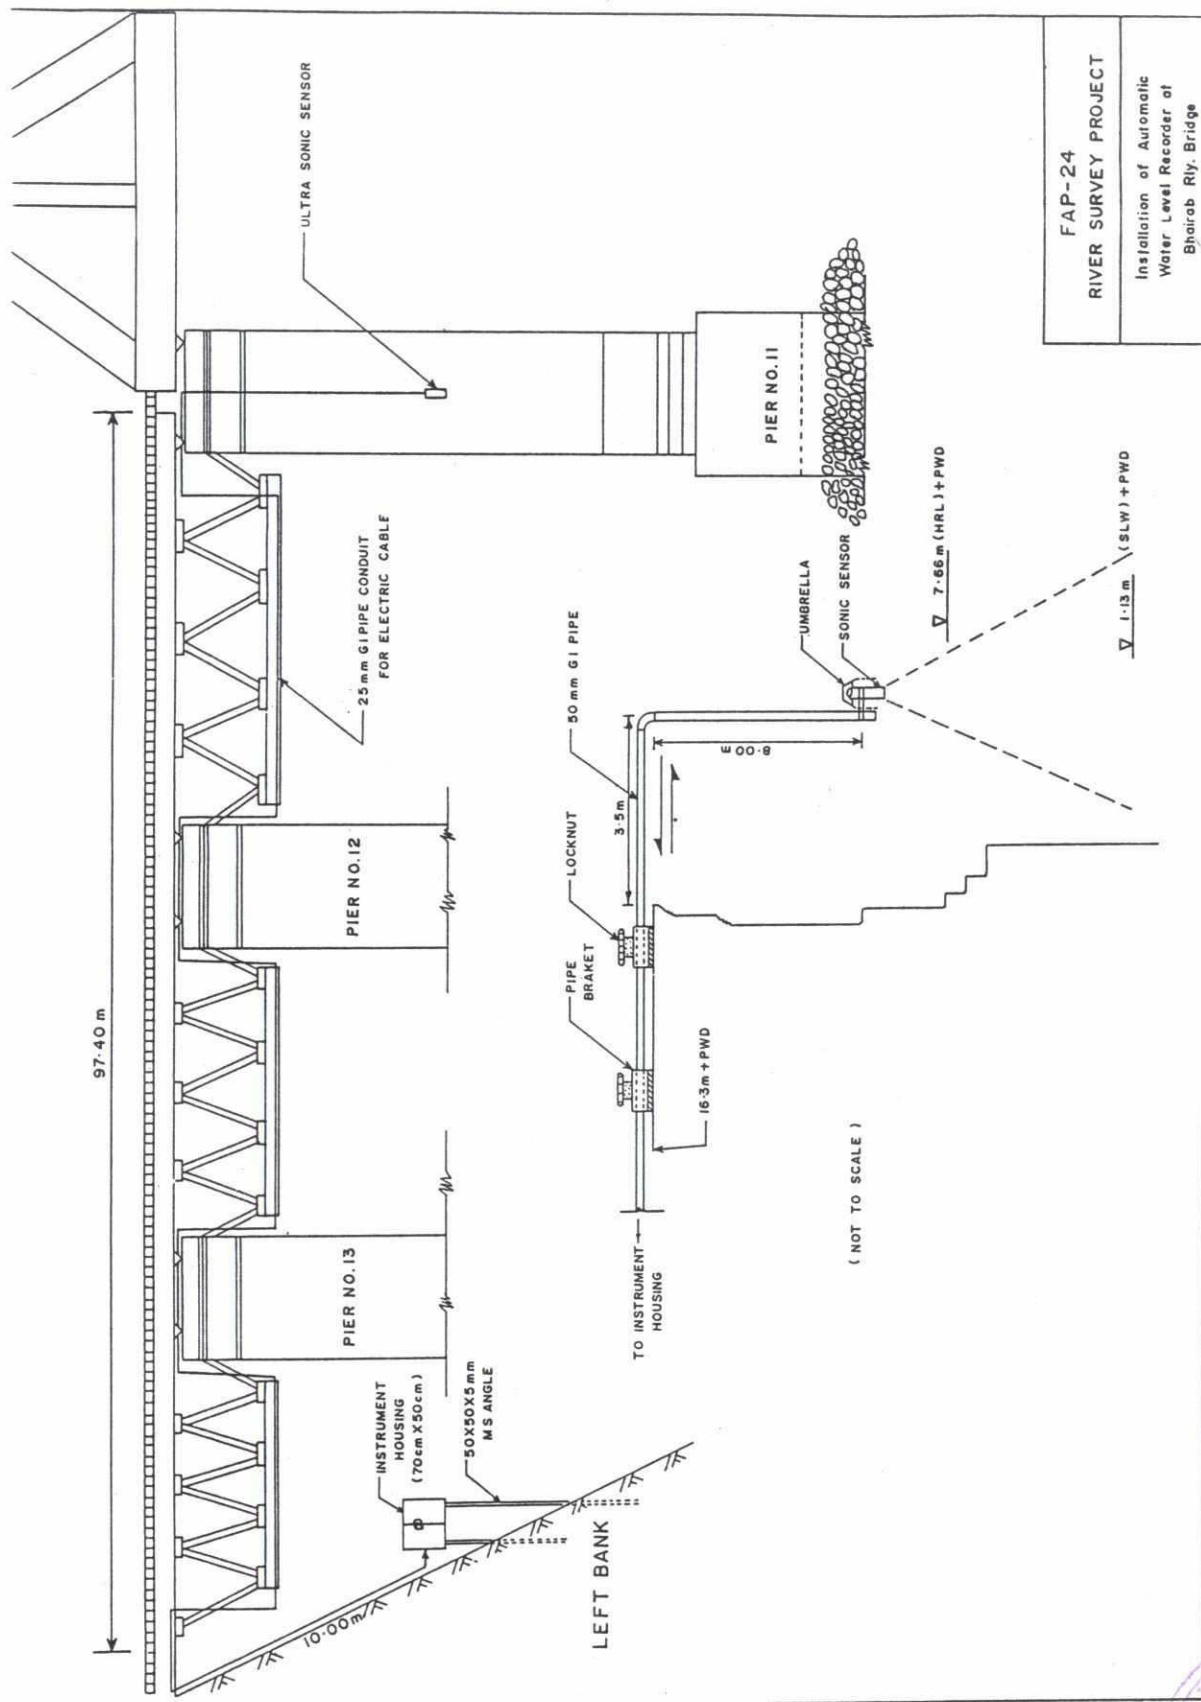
The design elements of the AWLR fixing at the Railway Bridge pier at Bhairab Bazar
